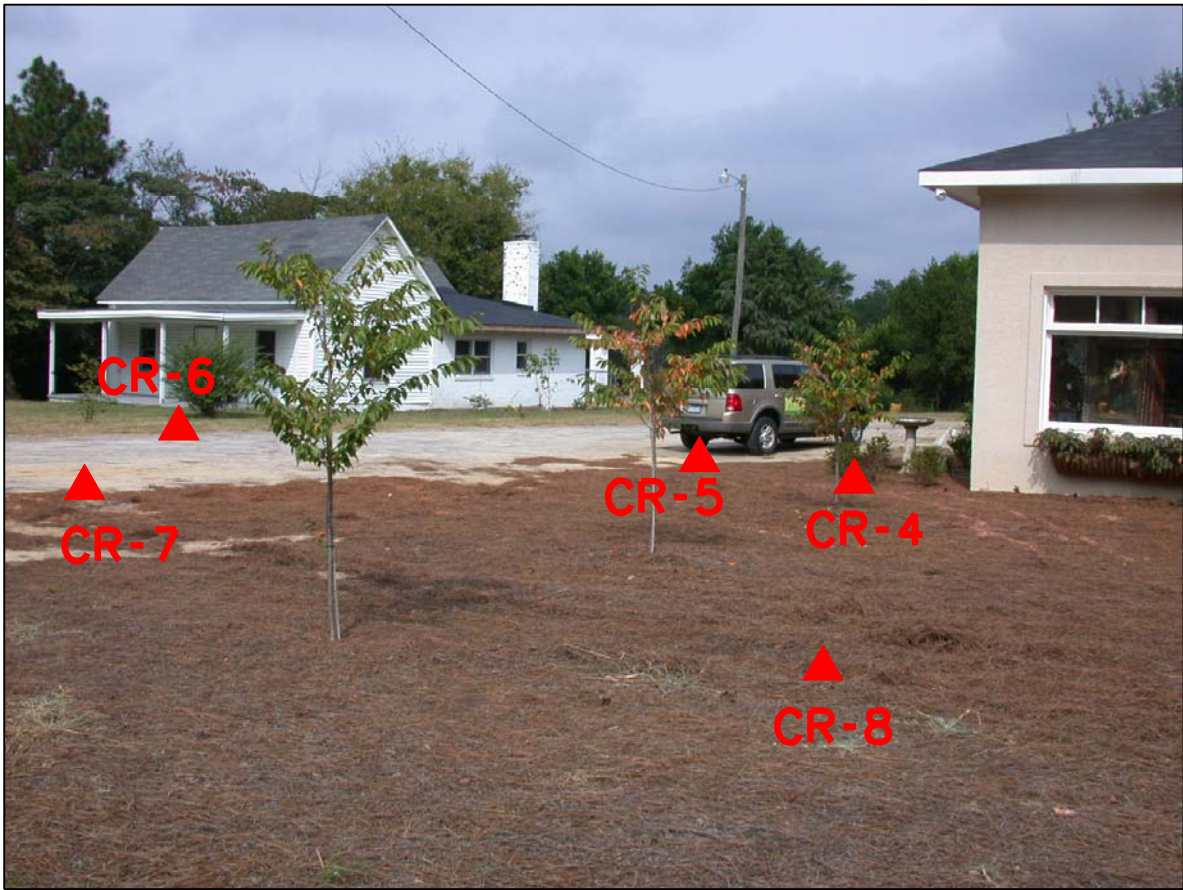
BORINGS WITHIN PROPOSED R/W LOOKING NORTHEAST
